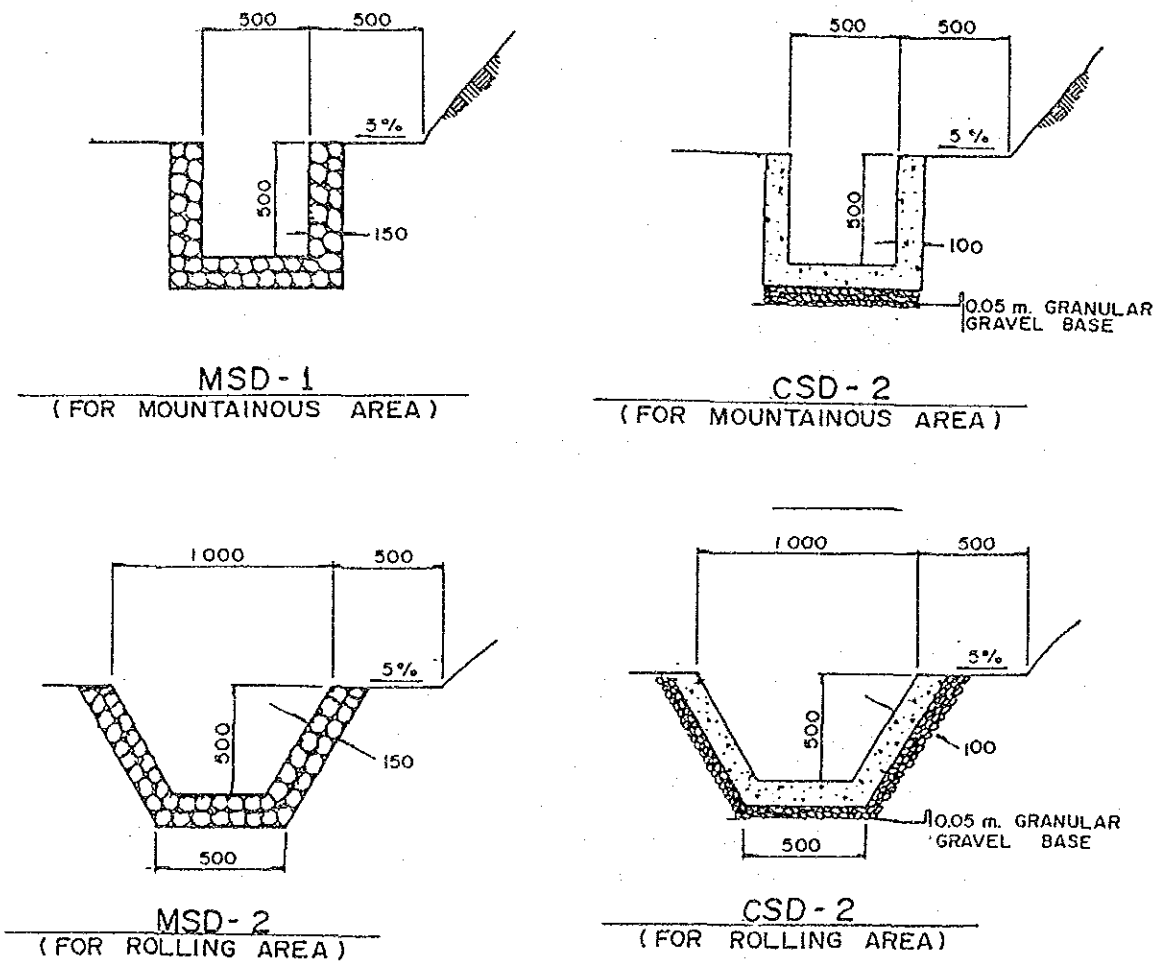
TYPICAL CROSS SECTION OF SIDE DITCH
